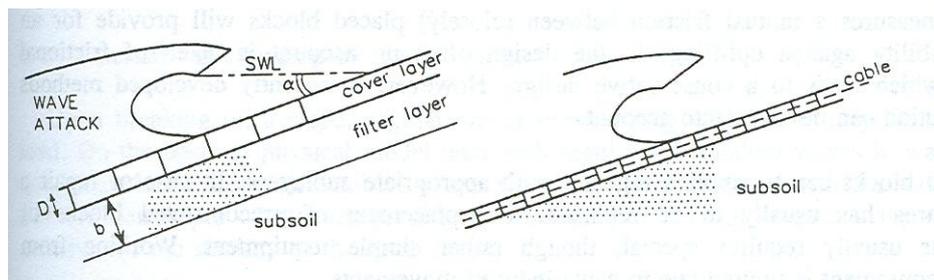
Examples of rock revetment structures (cross sections) (Source: Klein Breteler and Bezuijen, 1998)
